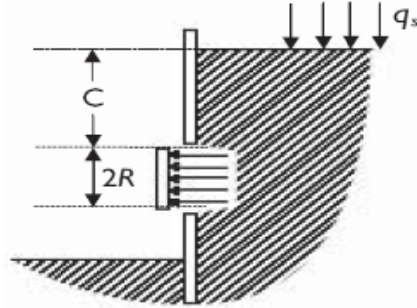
A circular opening in a thin retaining wall that supports soft soil to study face stability of tunnel (Broms & Bennemark, 1971)
